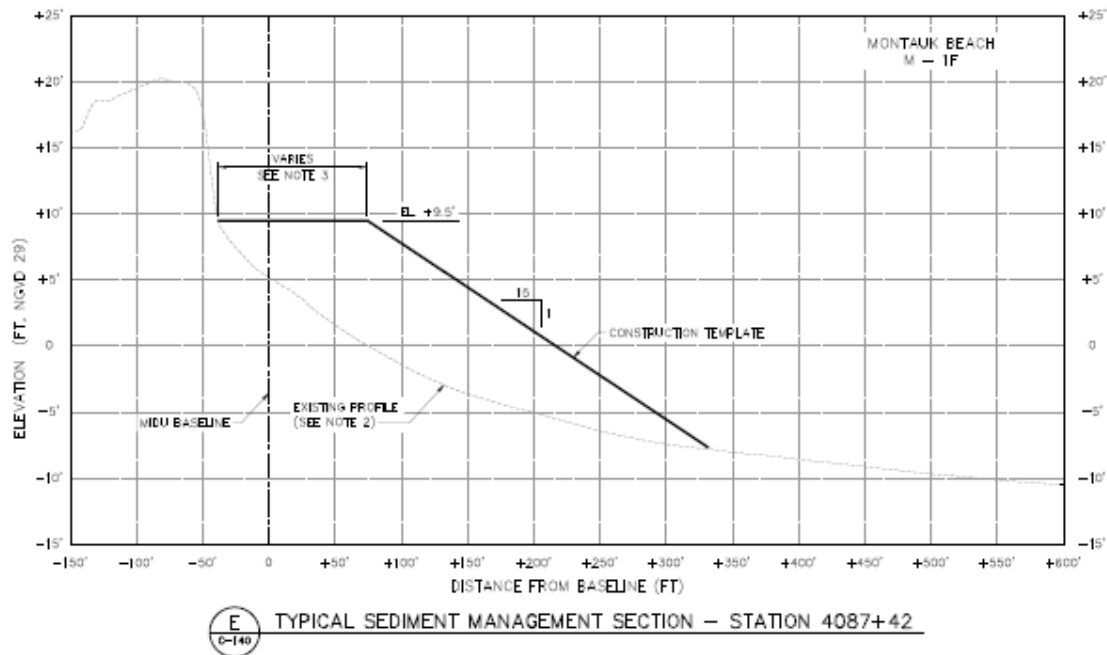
Typical Sediment Management Construction Template at Downtown Montauk
